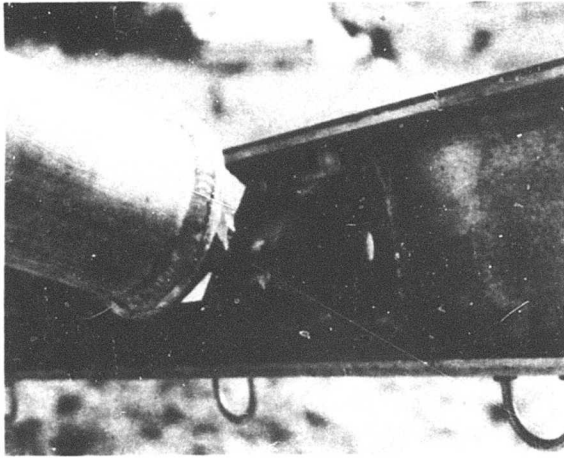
Attachment of Diagonal Truss to Lower Arch Beam
